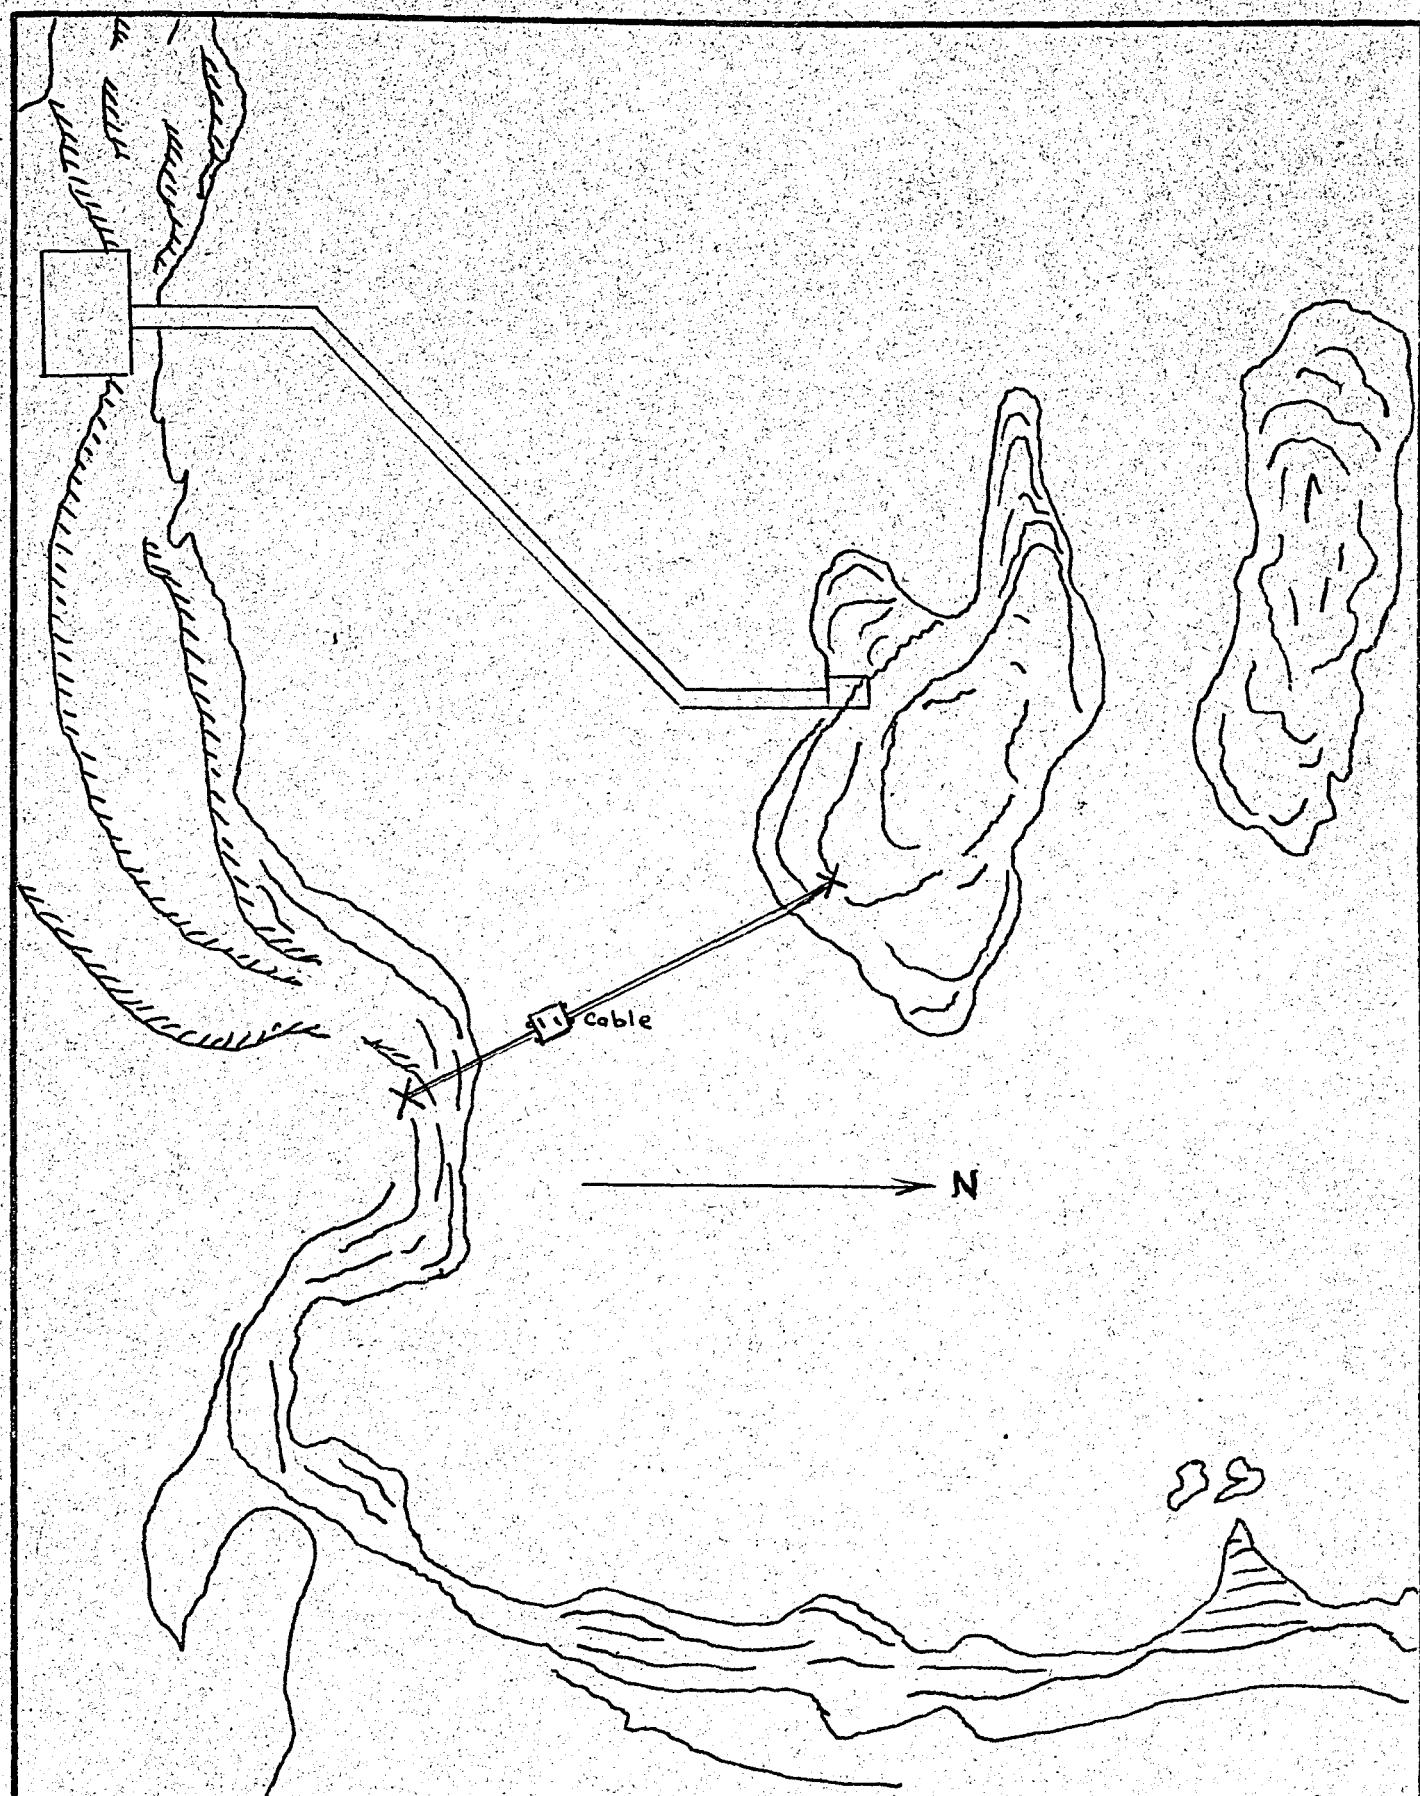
Plan of Project - Extension of Cable (Scale 1/1000)
